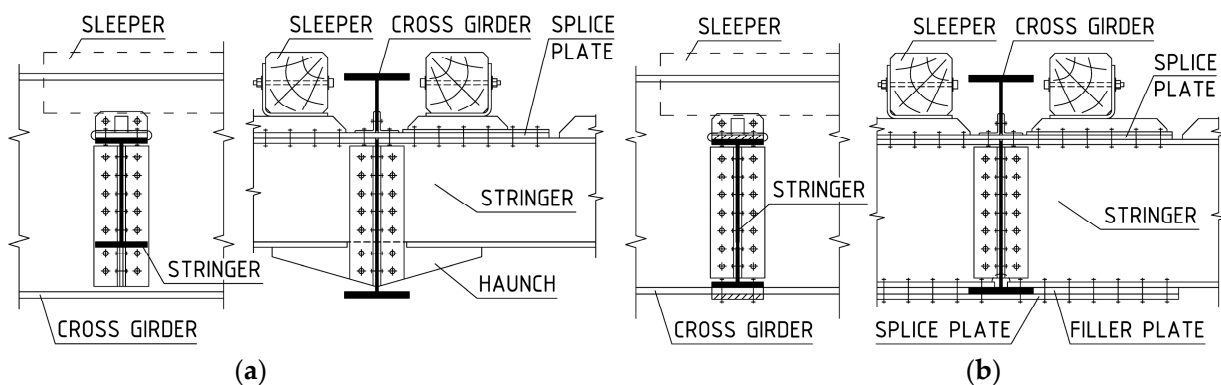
Arrangement of a typical stringer-to-cross-girder bolted splice connection (a) without lower flange connection and (b) with both flanges connection.
